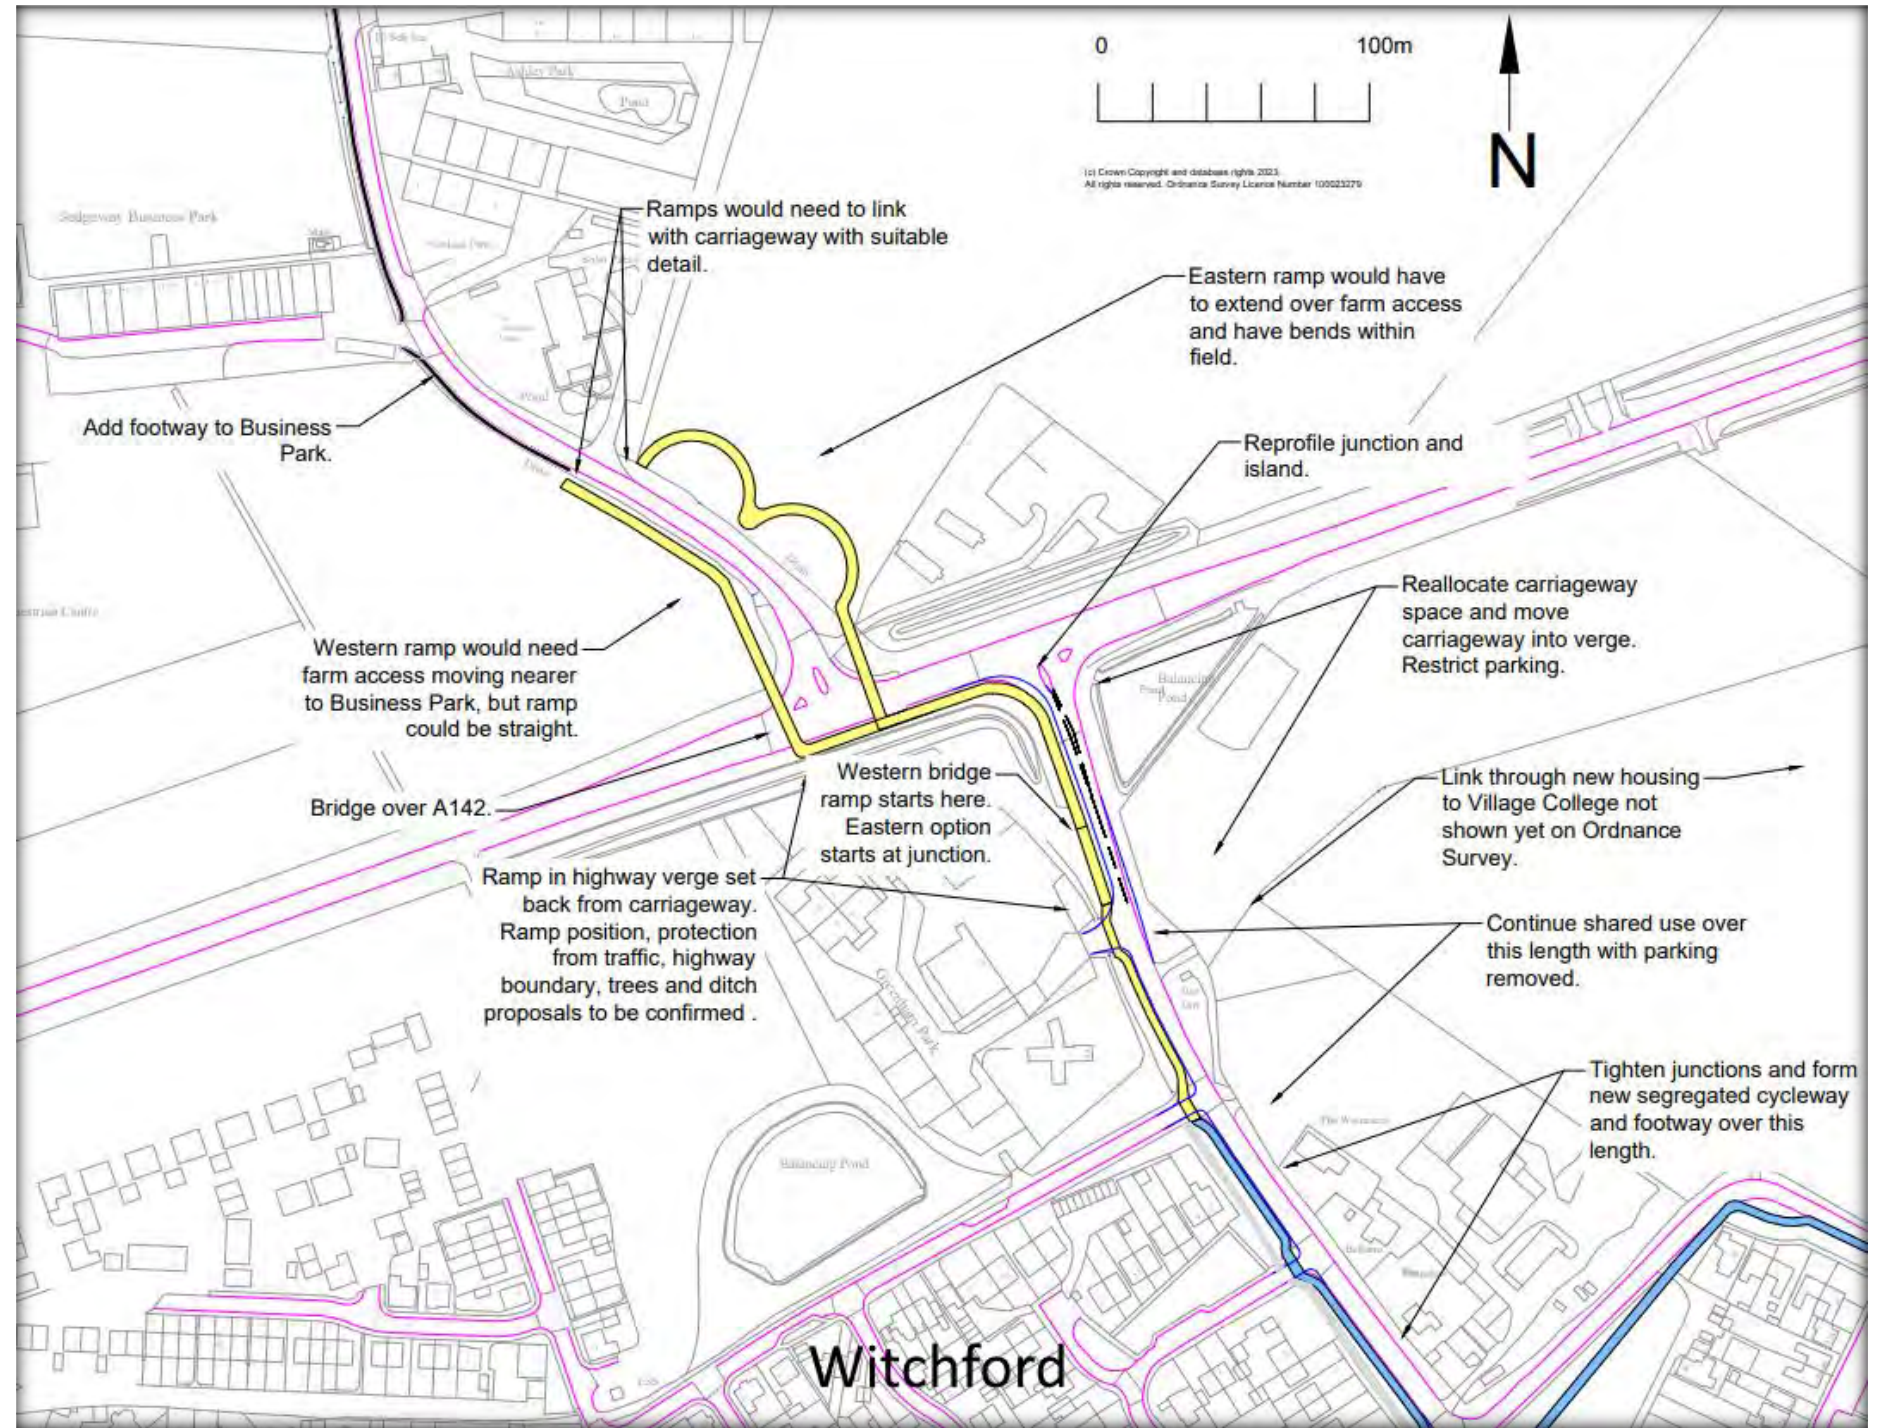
A.21.5 Preliminary Drawing showing possible layout for the two possible bridge positions.
